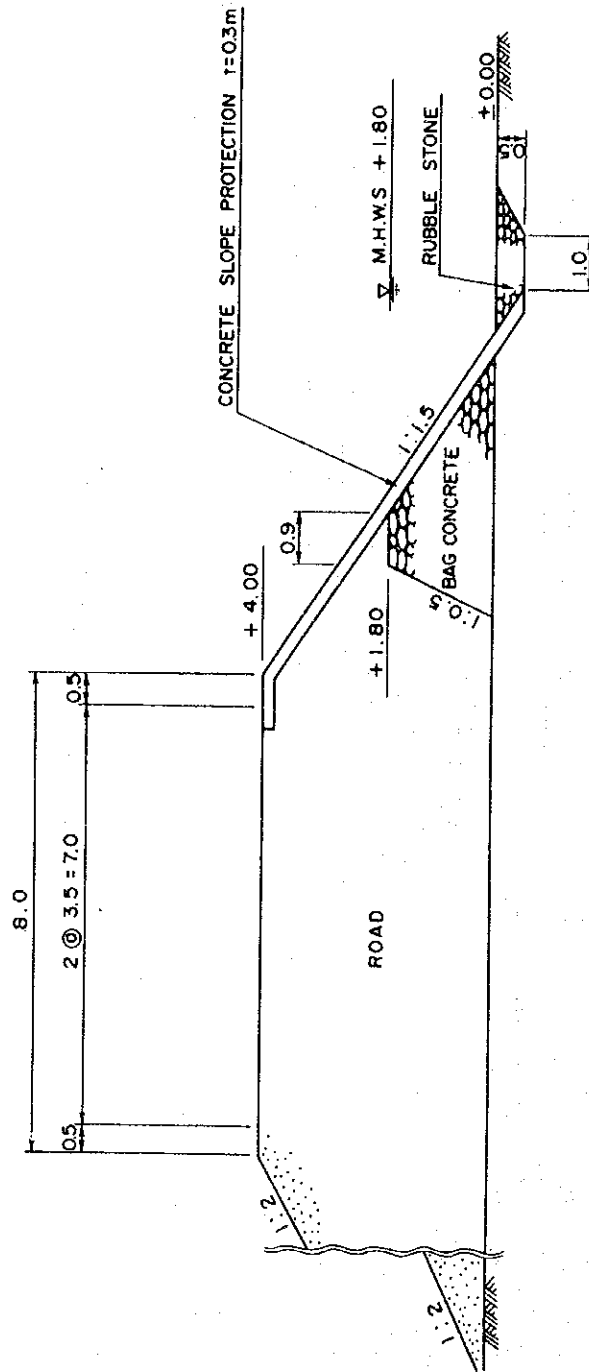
(2) Typical Cross Section of Seawall at Access Road
